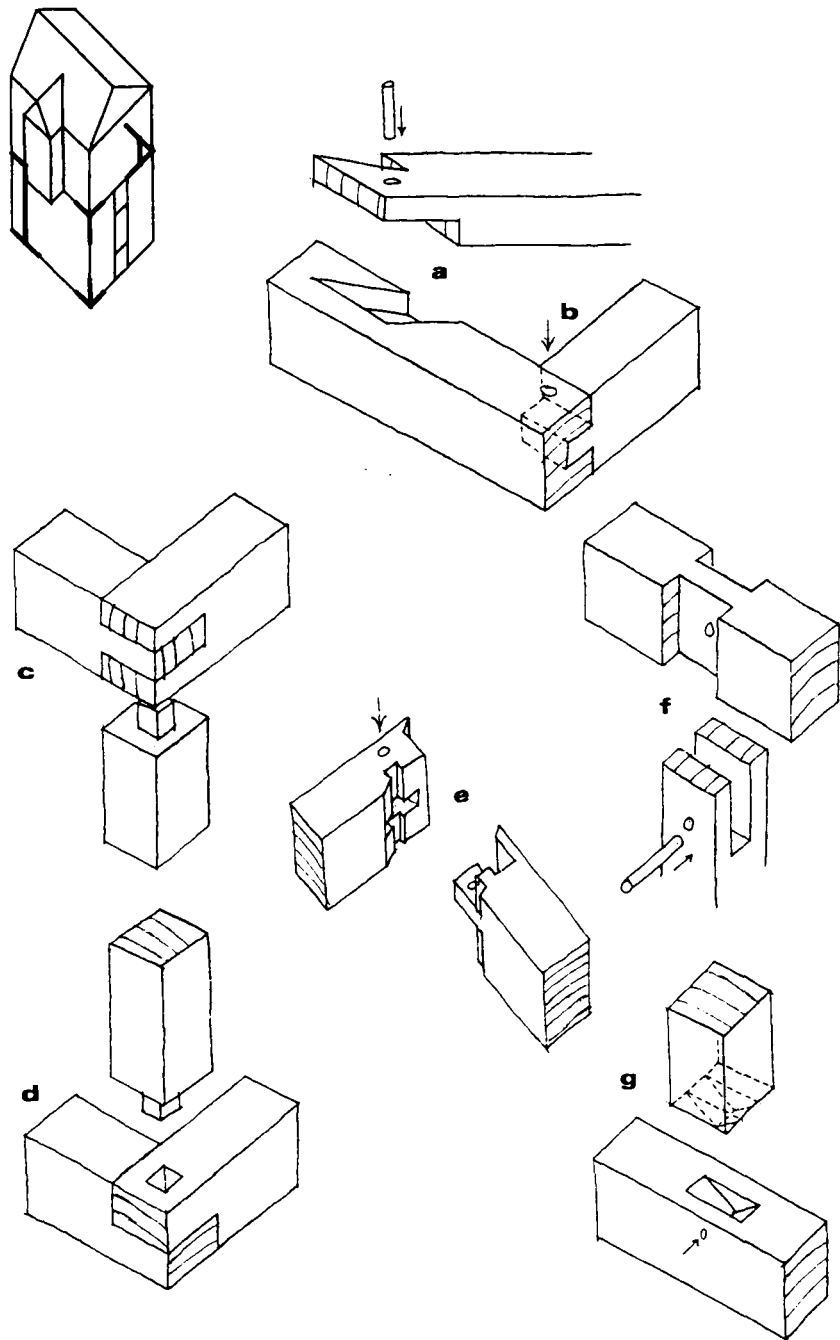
Various joints: a) Half lap halved stop dovetail; b) Half blind mortise and tenon corner; c) Open mortise and tenon with stub tenon post; d) Half lapped corner with stub tenon post; e) Mitered shoulder bladed haunch mortise and tenon; f) Fork tenon; g) Pointed tenon. The location of the joint in the framing system is shown on the upper left corner of the Figures 6–10.
